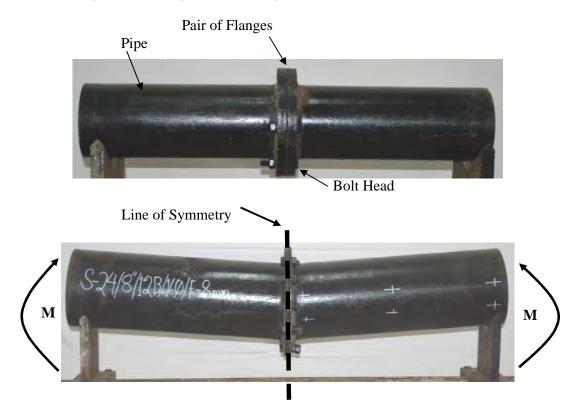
Front view and deflected shape of a flanged pipe joint specimen with 8 bolts
